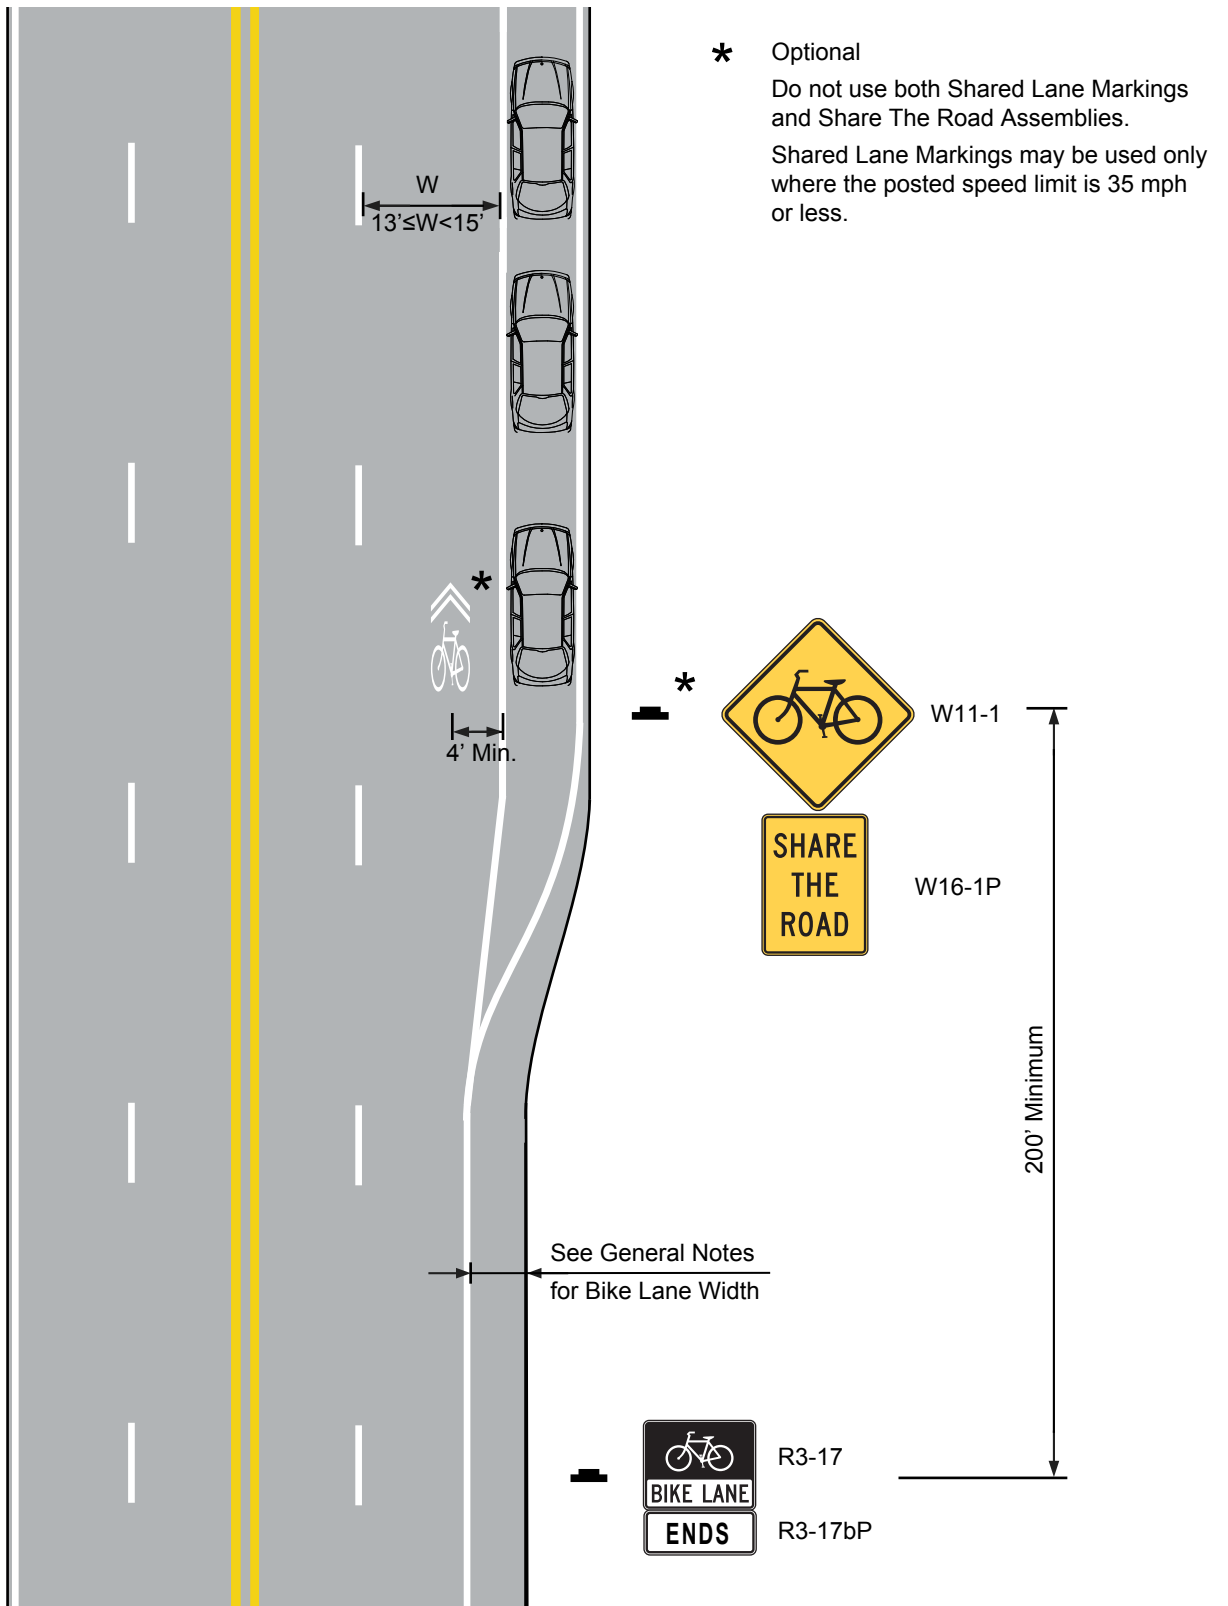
Example of Typical Transition from BIKE LANE without Parking to Narrow or No Shoulder
